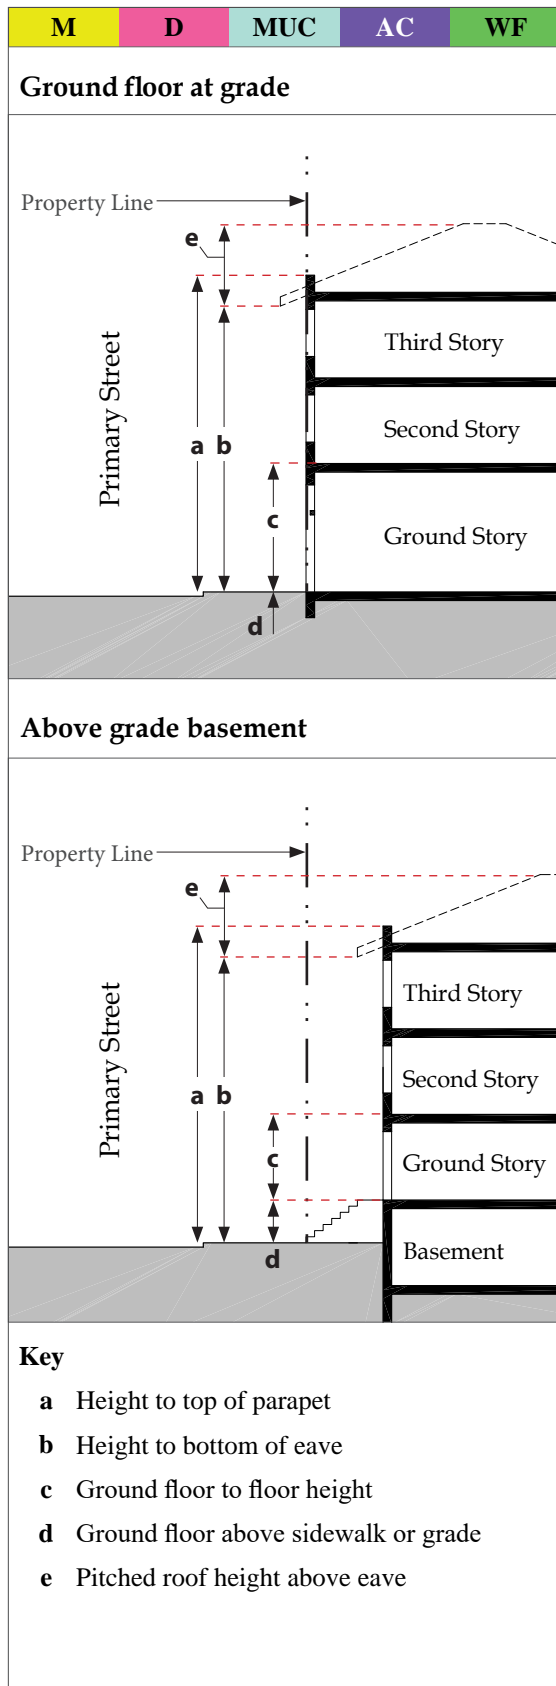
BUILDING HEIGHT (SEE TABLE 4.2, SECTION B)
